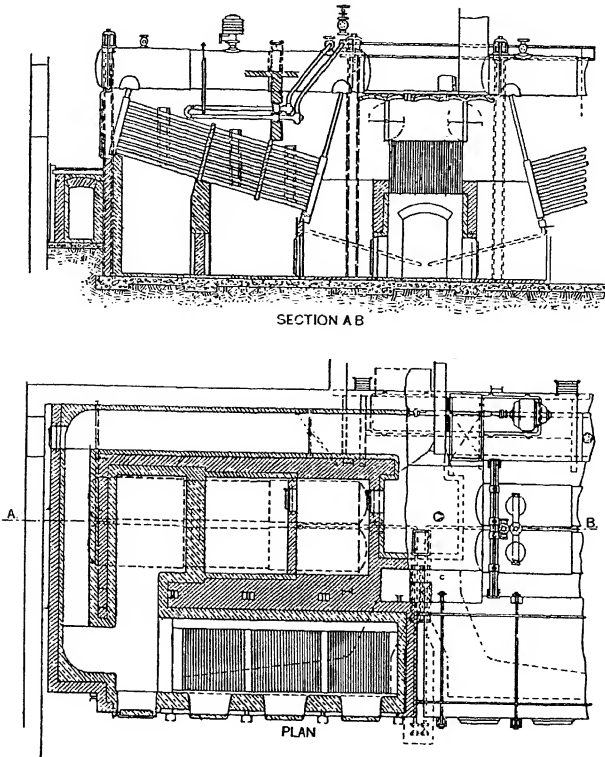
Heenan's Front-Fed Destructor at St Albans. Section and plan.
